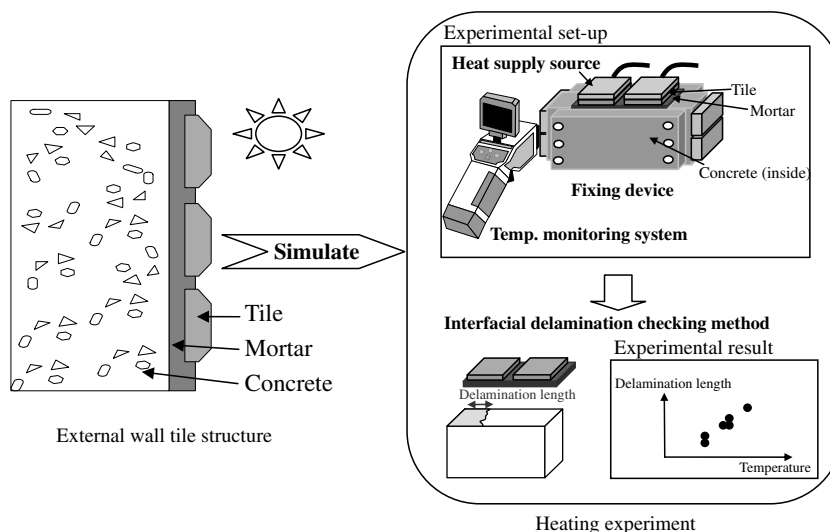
External wall tile structure and laboratory-scaled heating experiment.
